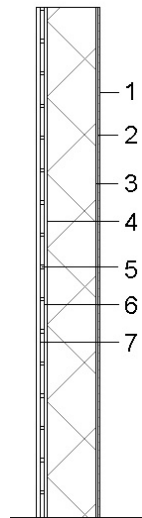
Autodesk Revit model of scenario B of basic wall detail
